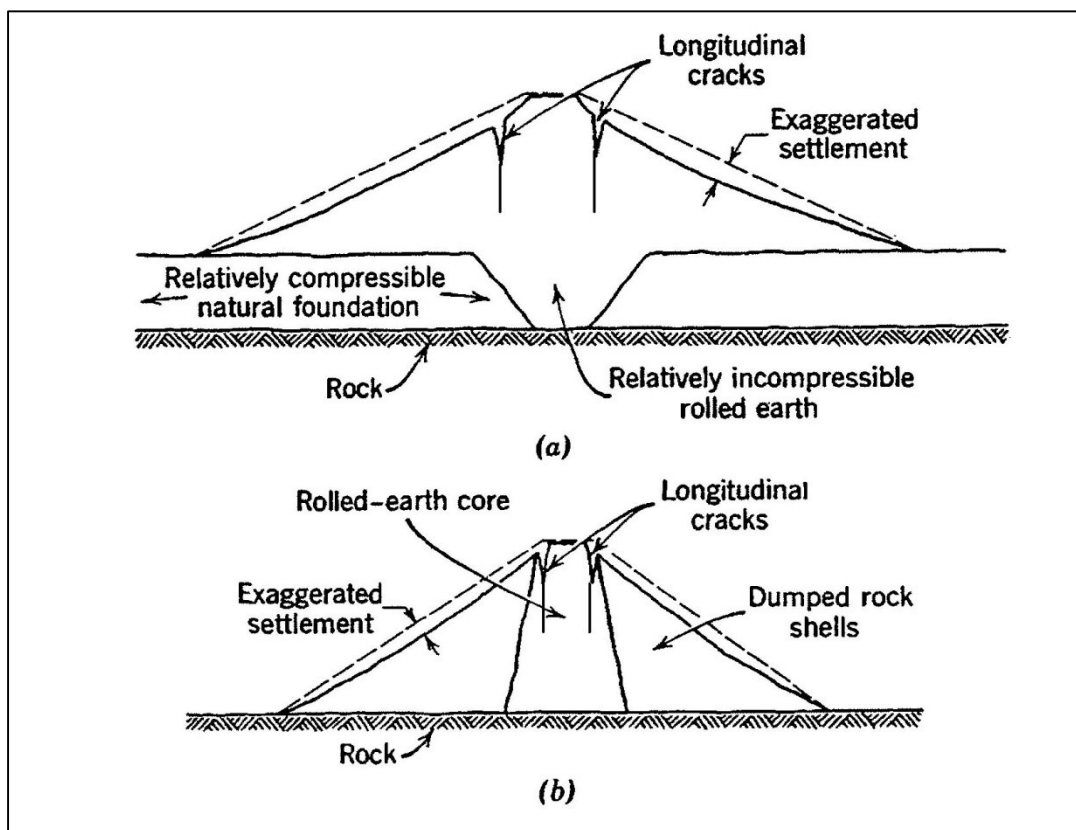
Longitudinal cracks. (a) Cracking caused by differential foundation settlement. (b) Cracking caused by differential settlement between embankment sections of dumped rock and rolled earth.
